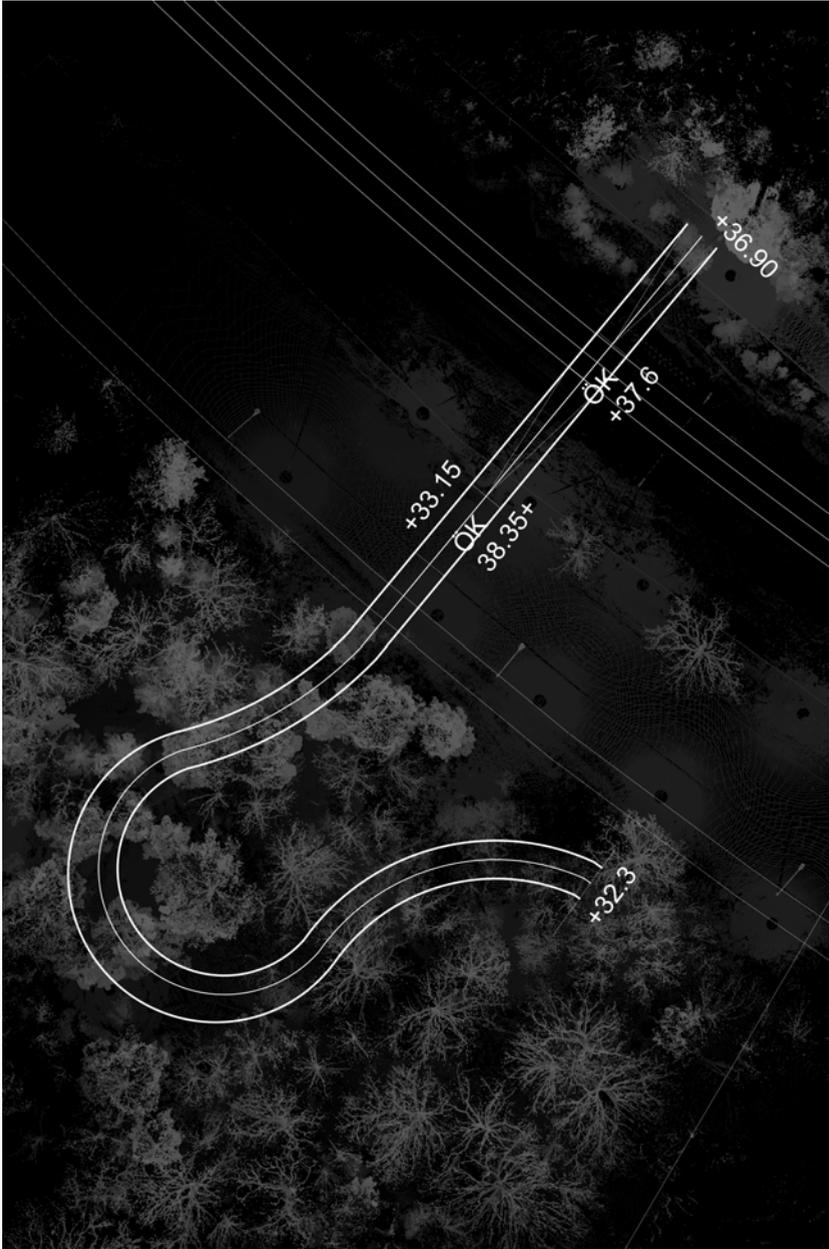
The "loop" in plan. The end-point height difference (+36.90m and +32.3m) as well as the requirements above the road (+38.35m) and tracks (+37.6m) required the bridge path to extend substantially beyond the direct span length.
